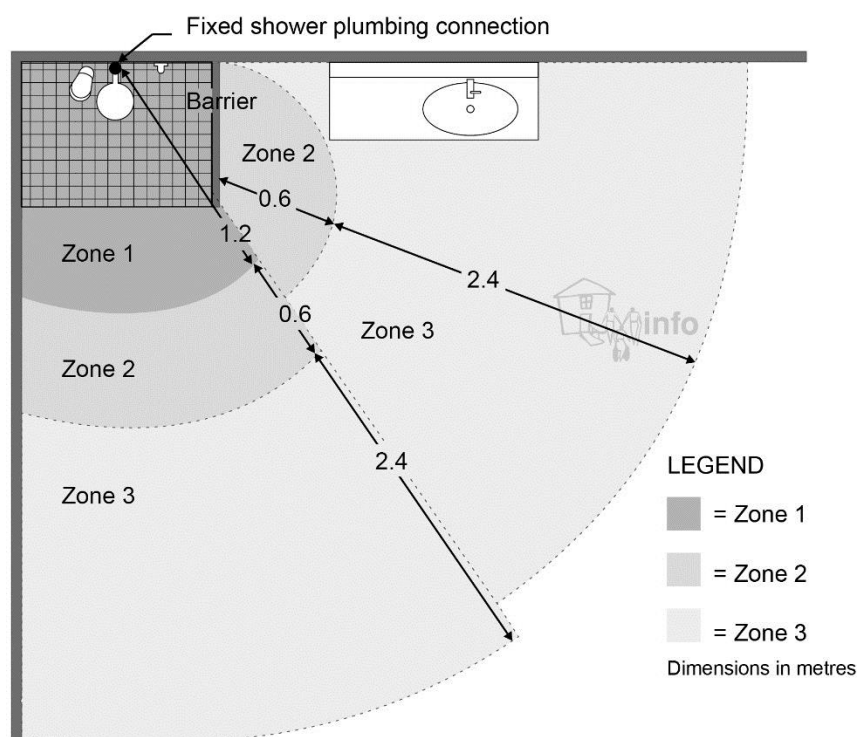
Bathroom Zones – Open Plan Shower: Effect of shower barrier on bathroom zones, plan view
